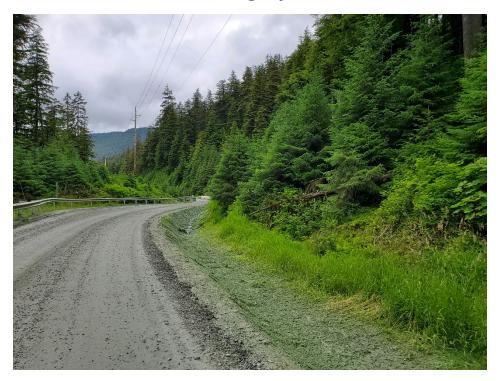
Ditch maintenance above 7.4-mile bridge.
